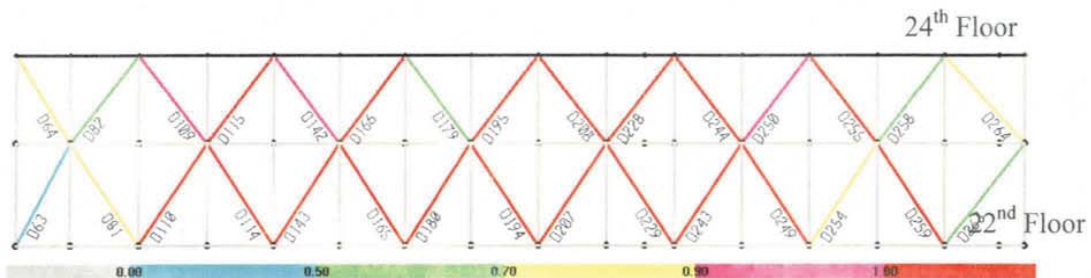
West Belt Truss between floors 22 and 24 diagonal diagram
